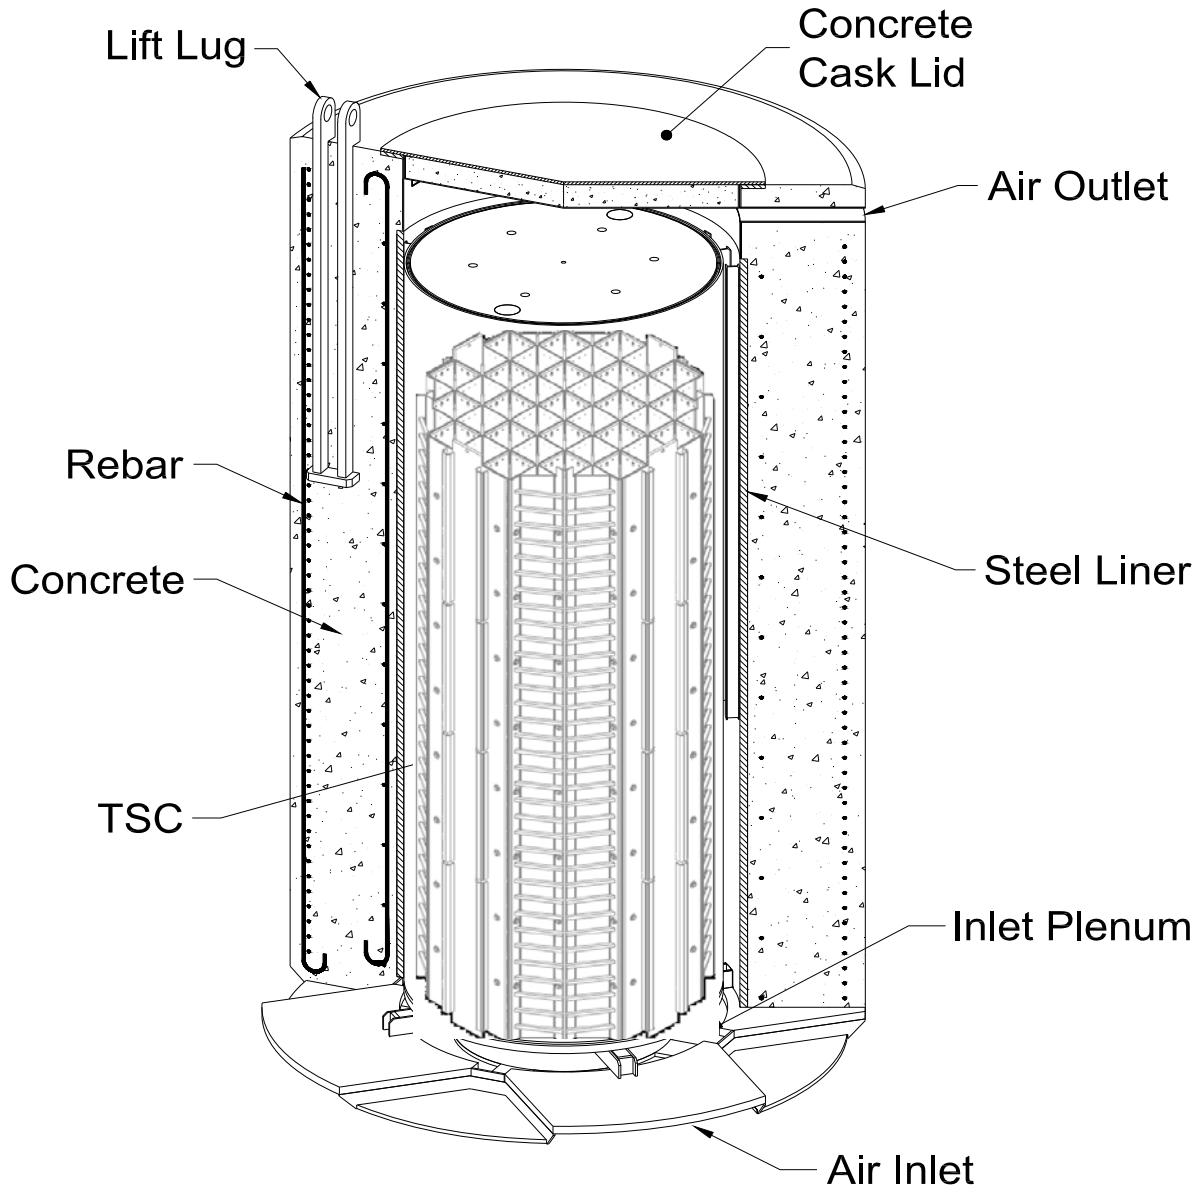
NAC International Dry Storage System with Vertical Concrete Cask (VCC)
